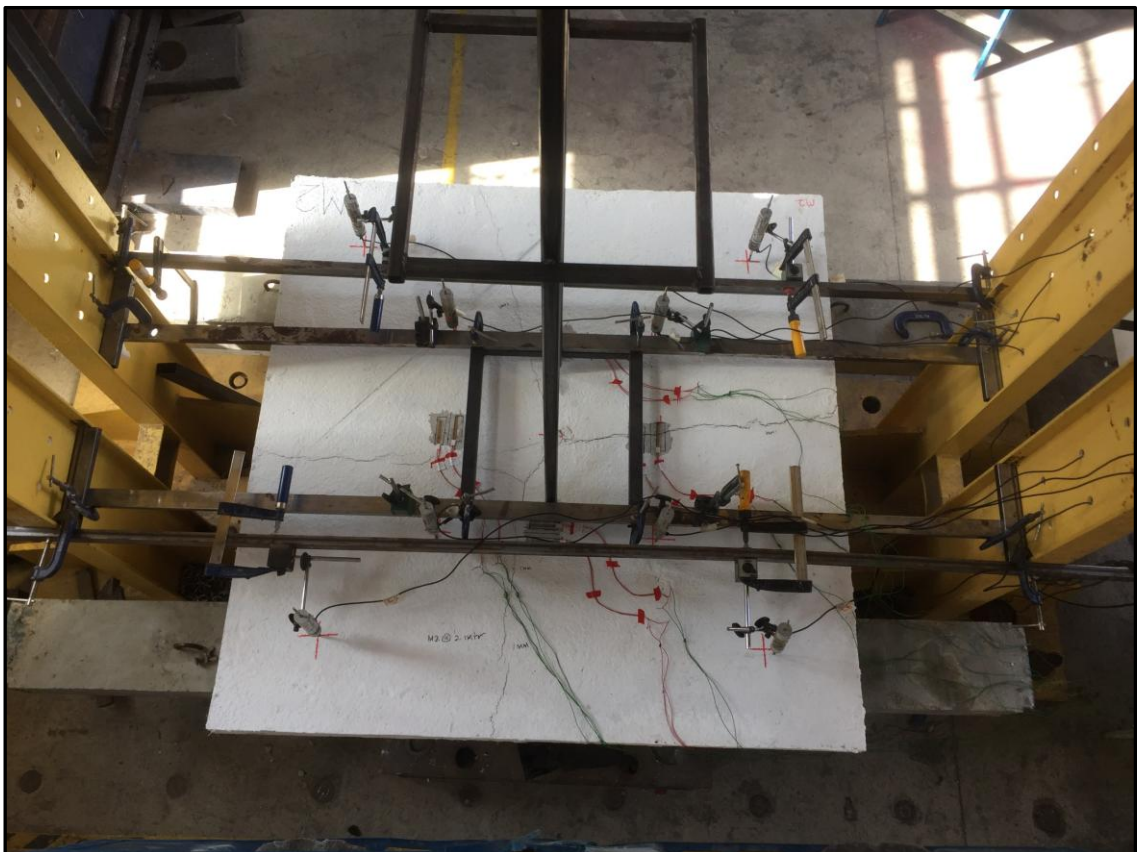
Final Crack Patterns for Impact Test Specimen M2
